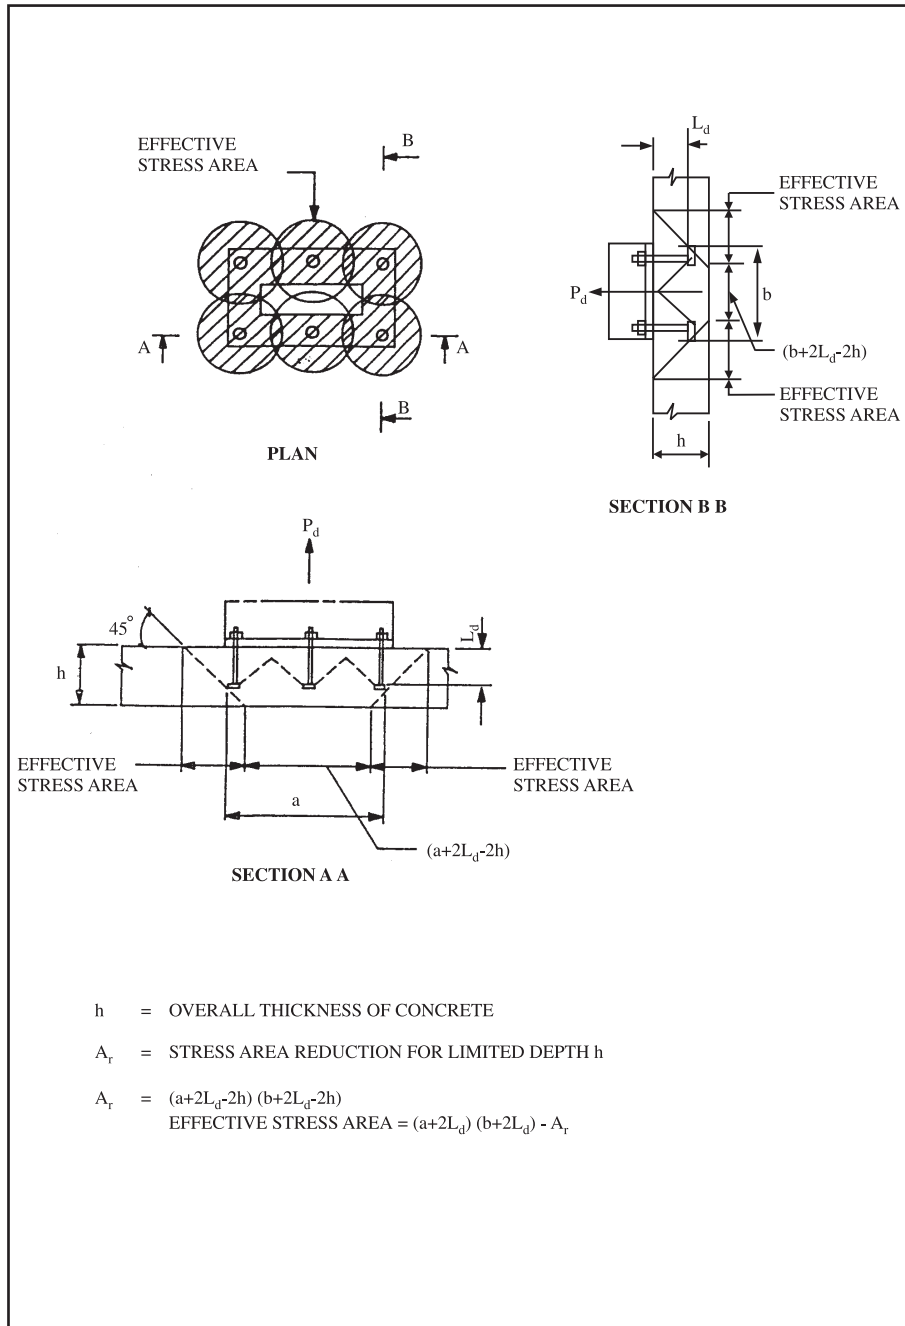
DETAILS OF STRESS AREA CALCULATION FOR EMBEDDED ANCHORS
